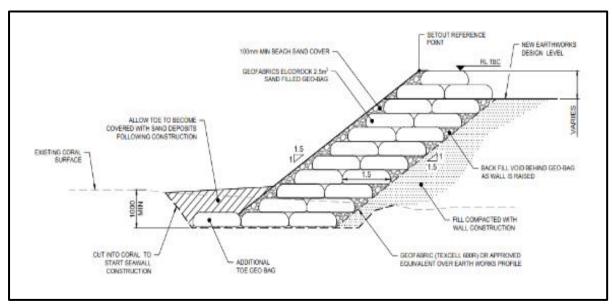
Typical seawall section proposed for Santa Cruz Airport
